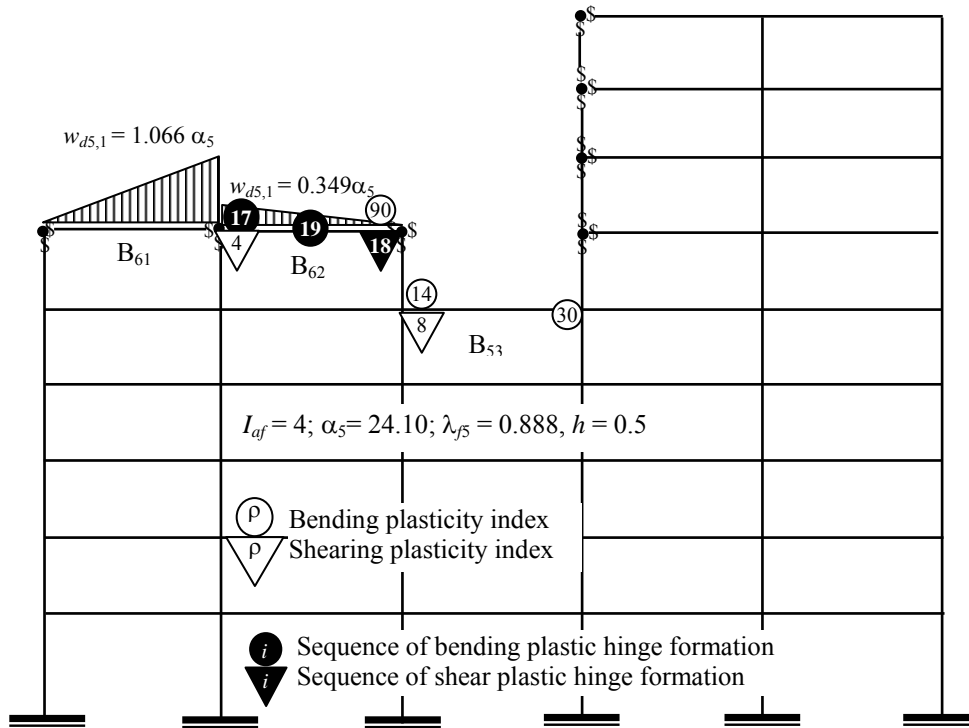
Example 5 ((Boston): Beam B_{71} falls as debris loading and beam B_{62} fails (Stage 5)
